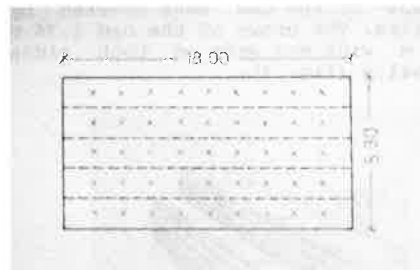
View from above of the mat to reinforce grounds, made according to Patent Nr 111 085 of different geotextiles and glass fibre fabrics.
